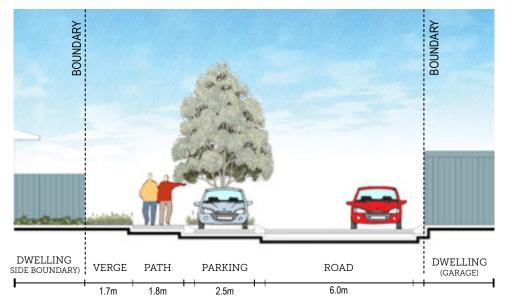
Access Street D Typical Cross Section (source: Emerge)
